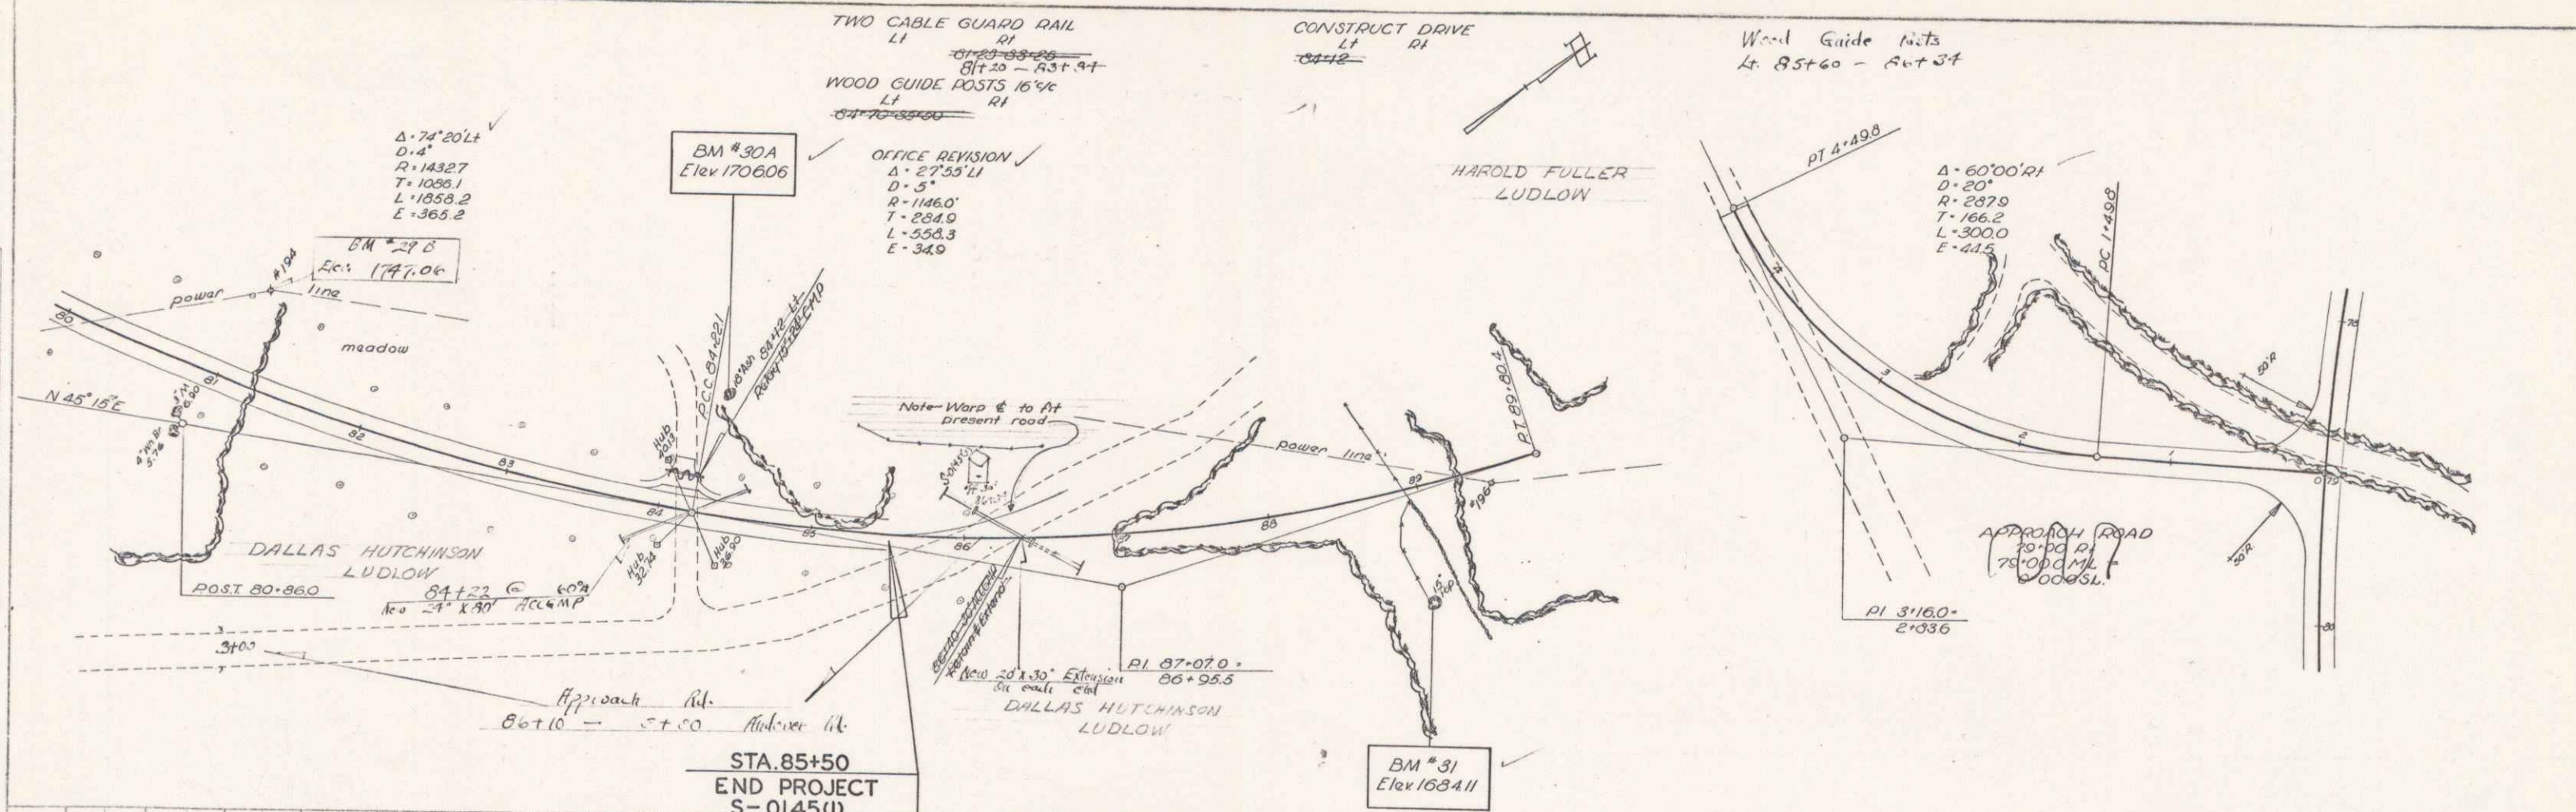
PLAN PROFILE 80' P & A & STANDARDS
